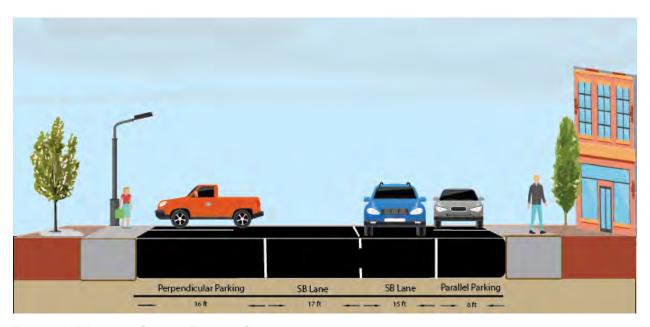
WOLCOTT STREET TYPICAL SECTION
